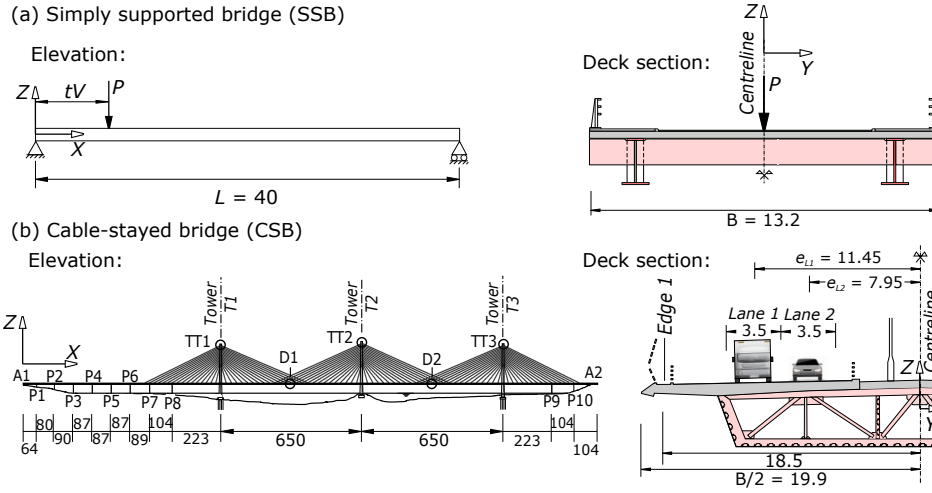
Elevation and deck cross-section of the proposed bridges: (a) simply supported bridge (SSB), (b) Queensferry cable-stayed bridge (CSB). Dimensions in meters.
